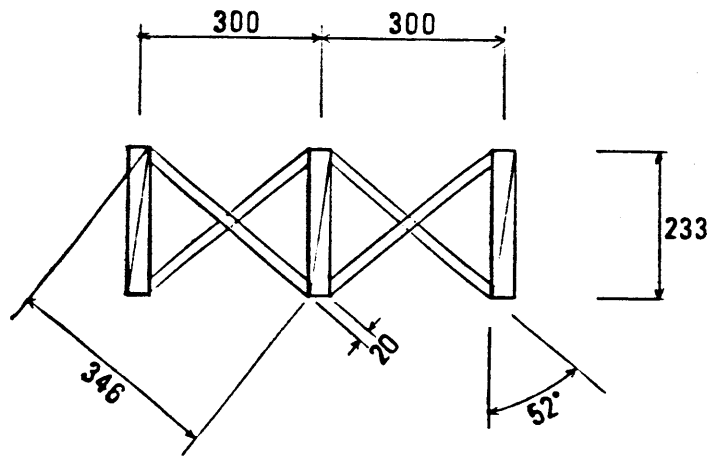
3 0 Construction detail of No.4 - 5 specimen.
